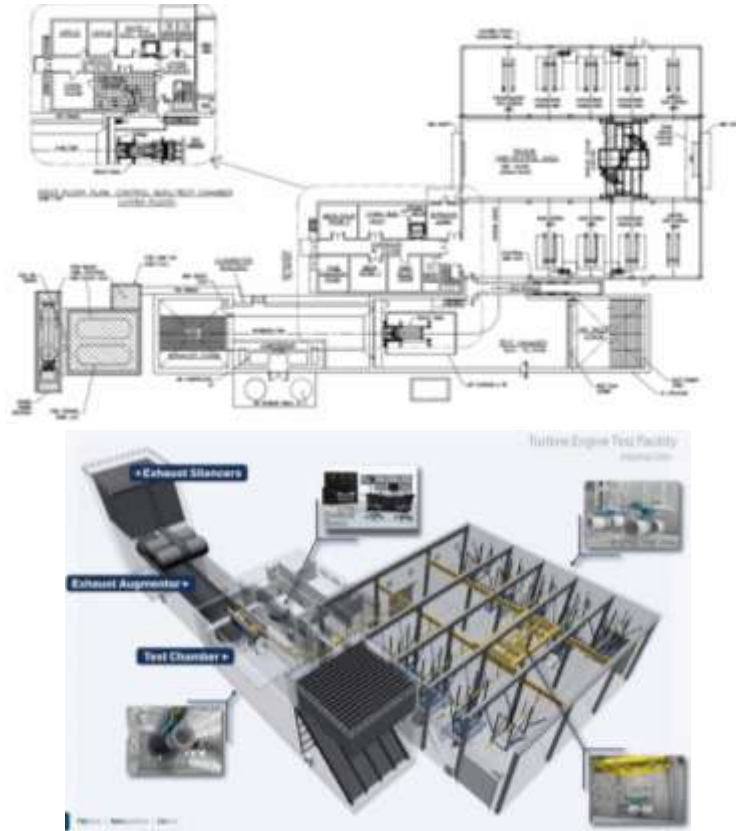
New LEAP Engine Testing Facility Development Plan and Illustration
